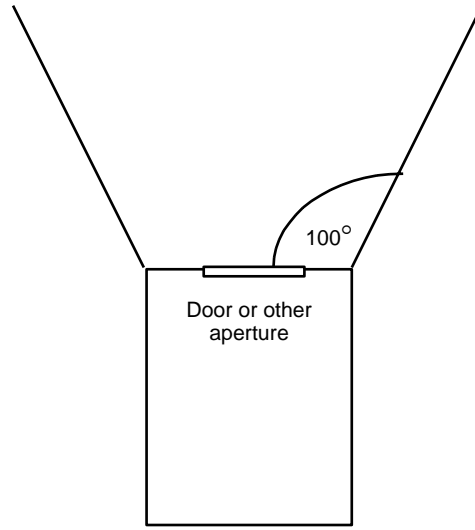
Earth Covered Building Containing HD 1.2 as a PES or ES
